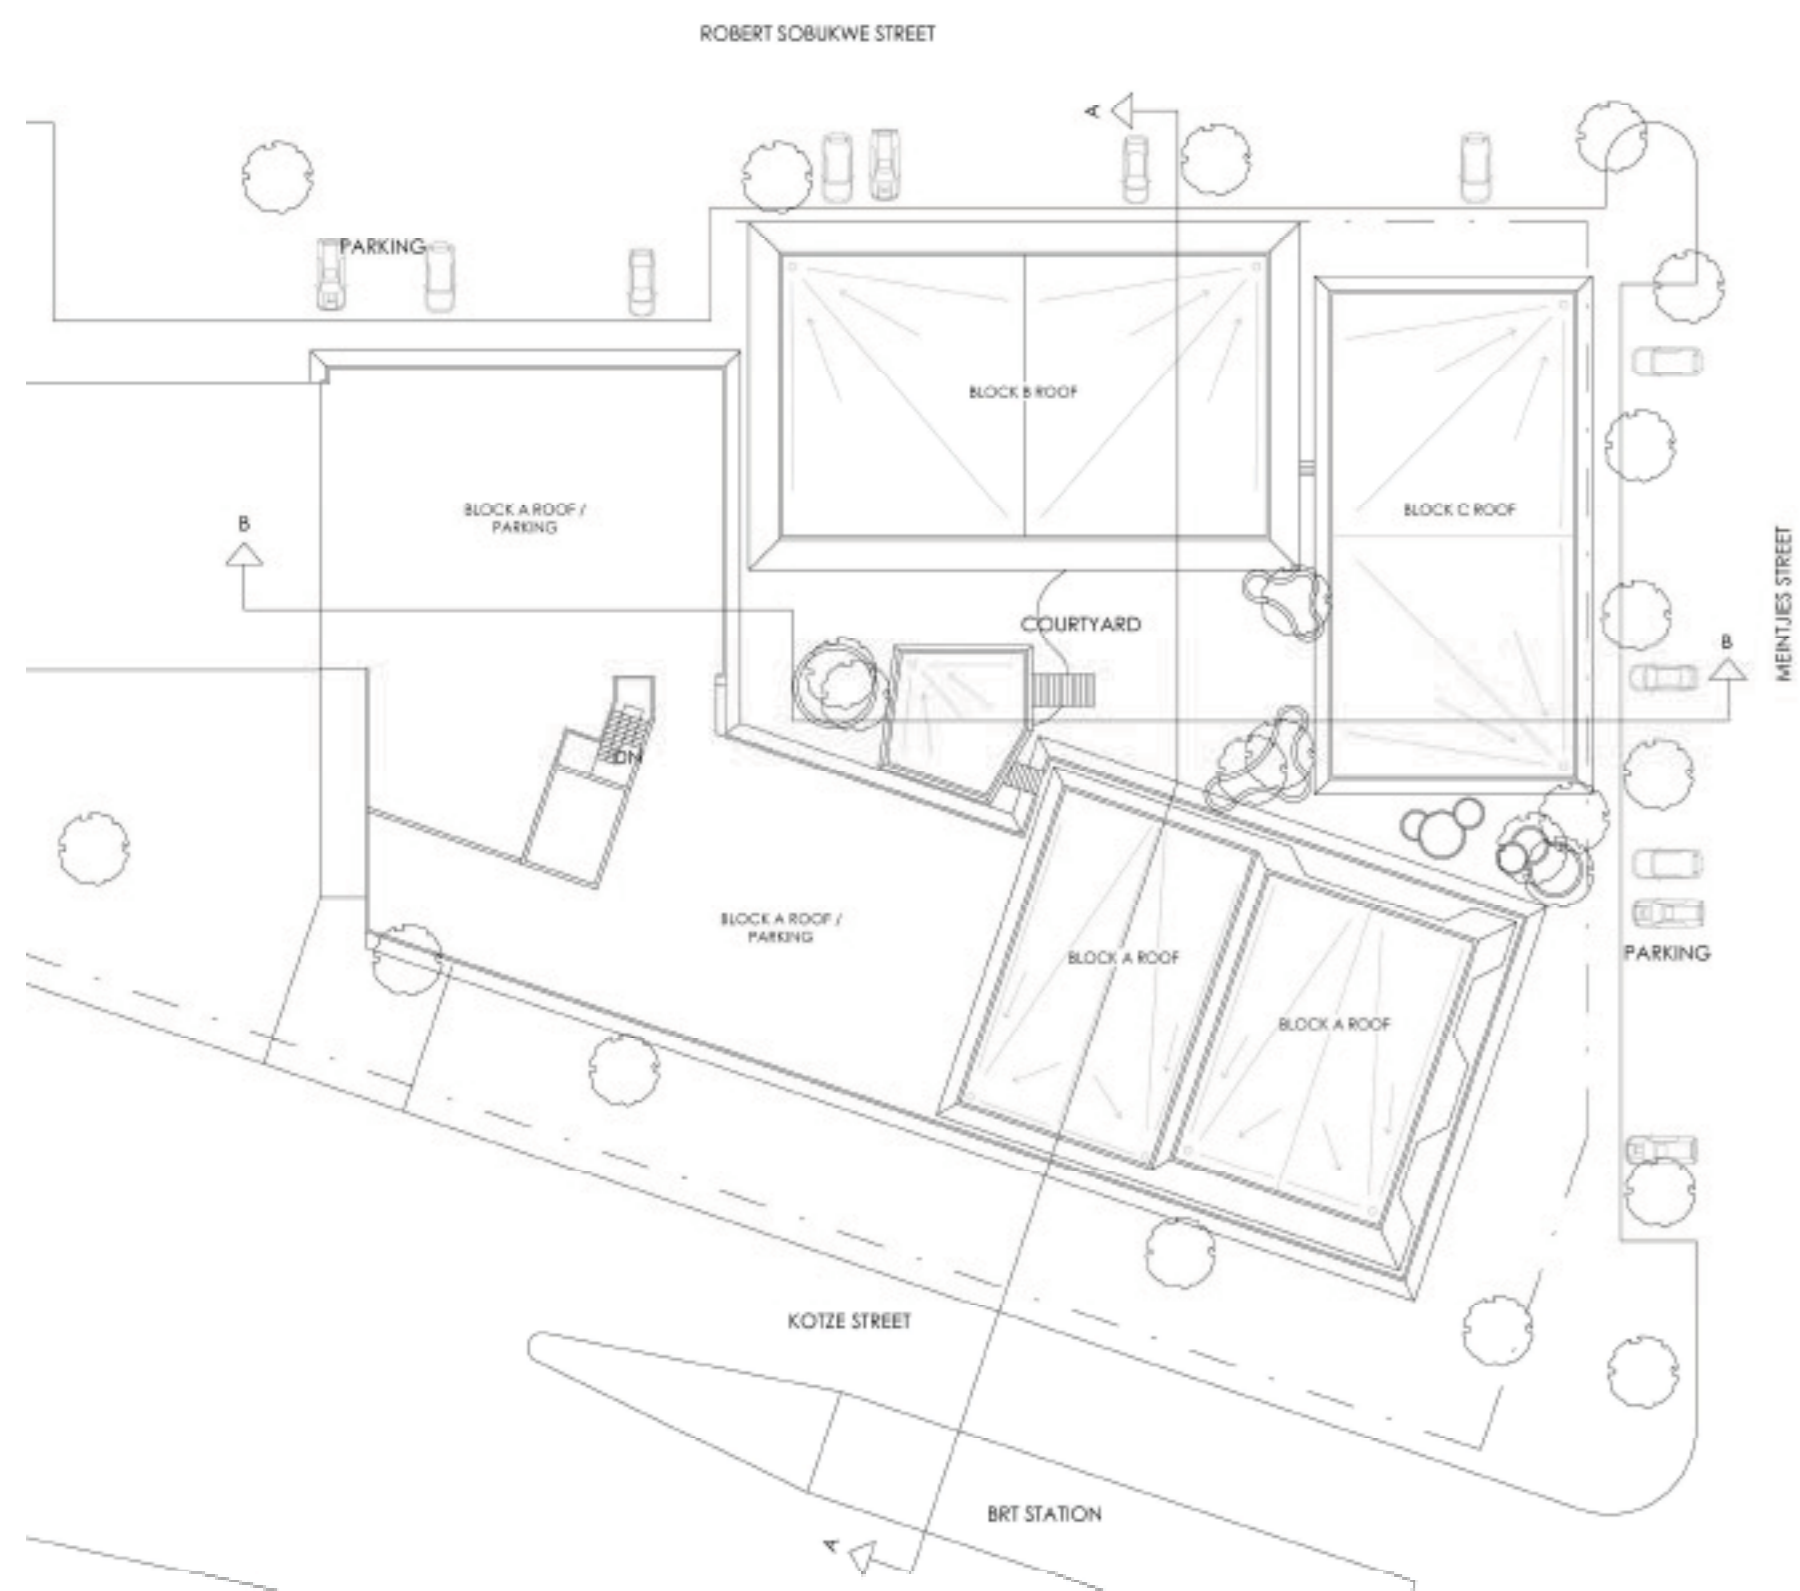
Existing Roof Plan Scale 1:500
